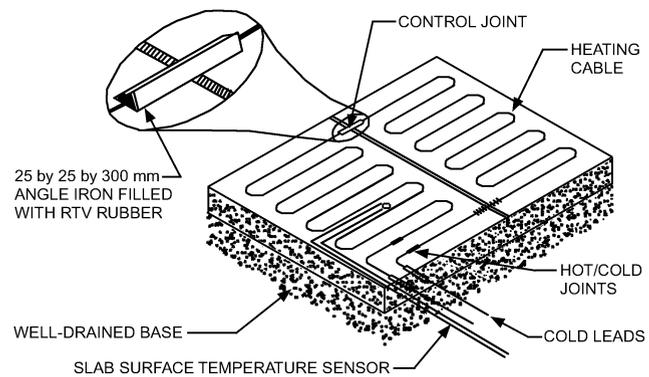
Typical Mineral Insulated Heating Cable Installation in Concrete Slab
